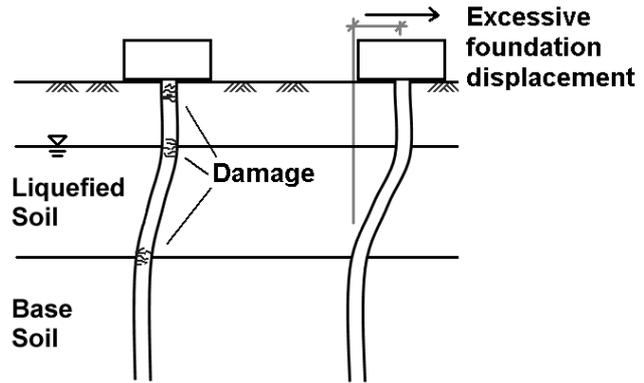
The two most common modes of 'failure' of piles in laterally spreading soils: pile damage and excessive foundation displacement
